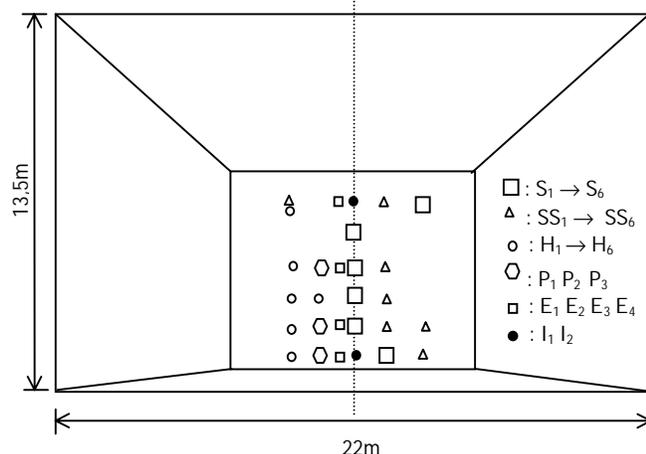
Instrumentation Layout Plan of Geogrid Test Embankment
